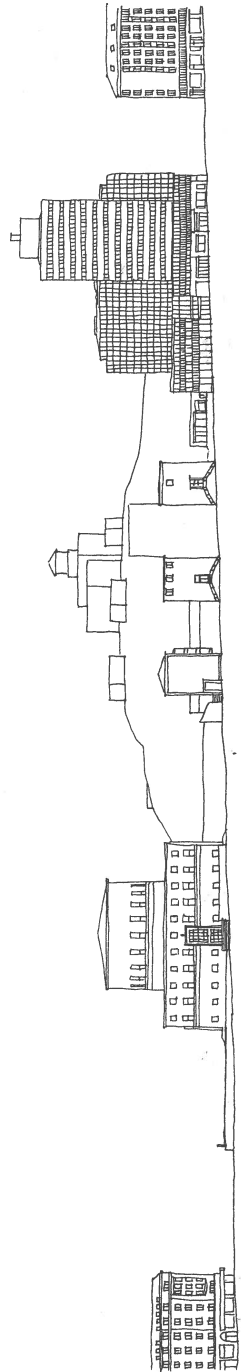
north elevation 1:2000, proposal pre p2 crit
